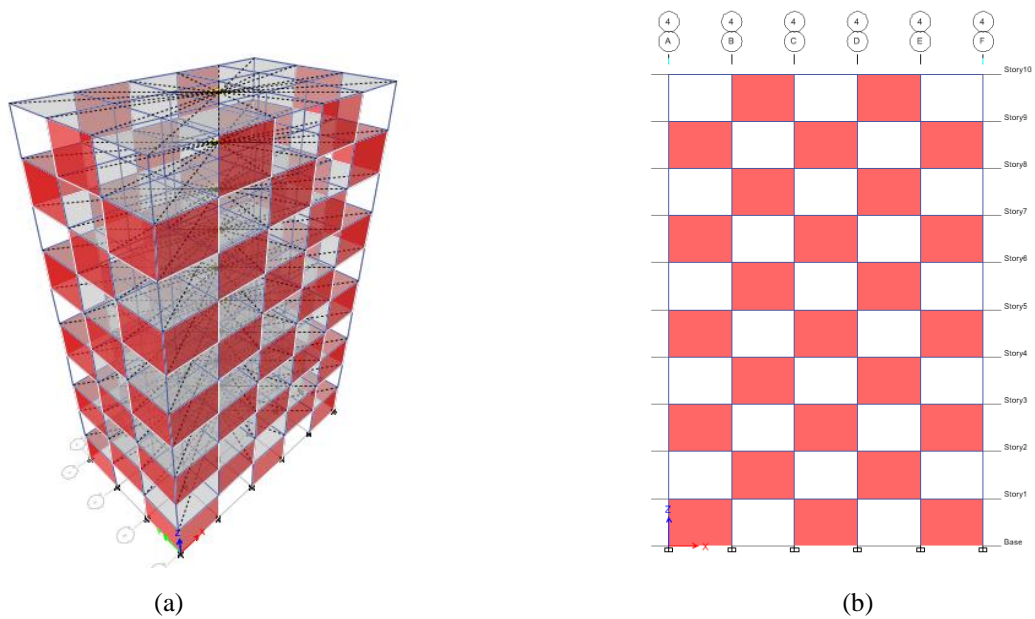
Staggered Shear Wall (a) 3D View (b) Elevation
